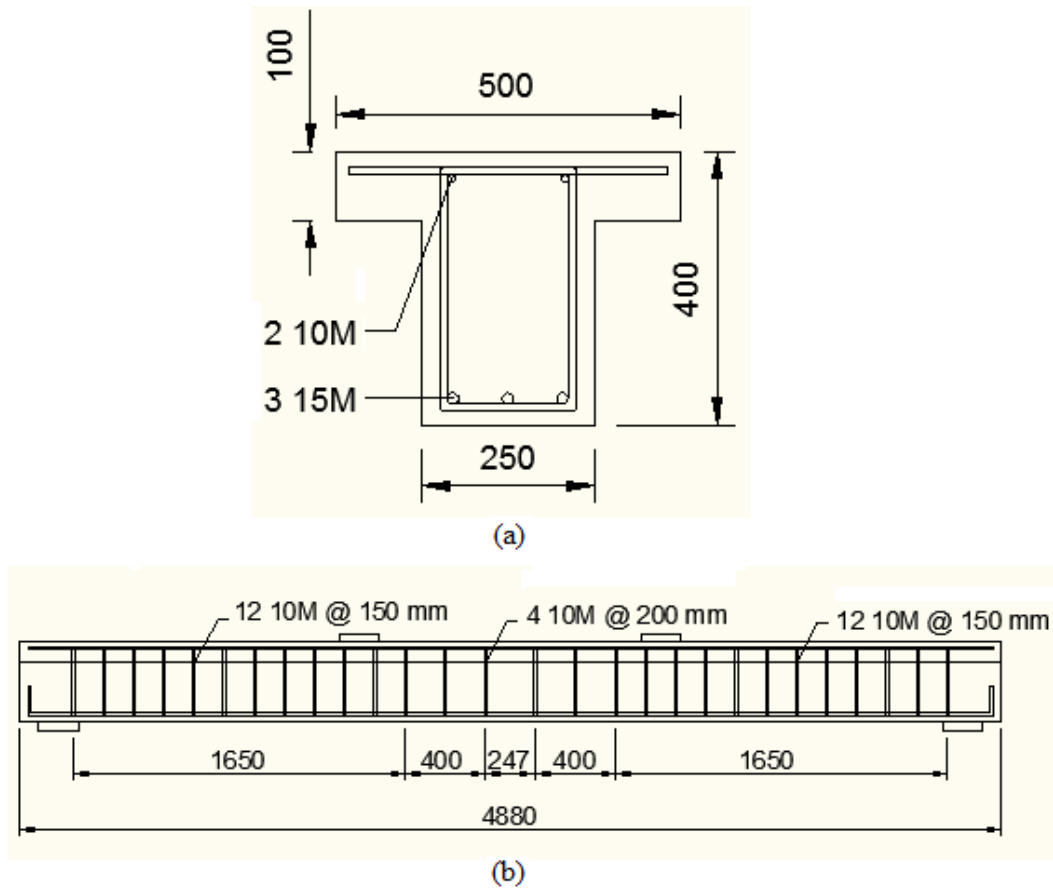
Phase Two beam (a) Cross-section and (b) Elevation view
